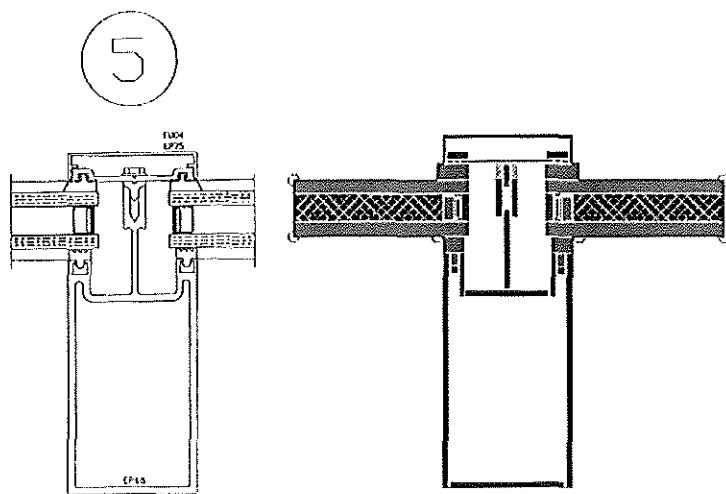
Detail and FRAME model of the curtain wall vertical mullion.
